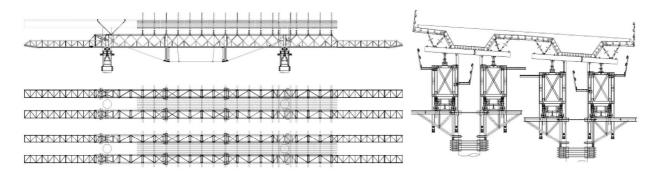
Elevation, plant view and cross section of OPS movable scaffolding system (BERD & AFAssociados 2005).
